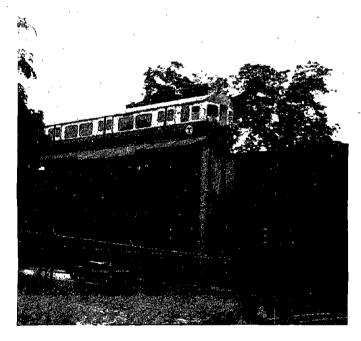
ORANGE LINE ELEVATED STRUCTURE WITH LATTICE WEB GIRDERS
